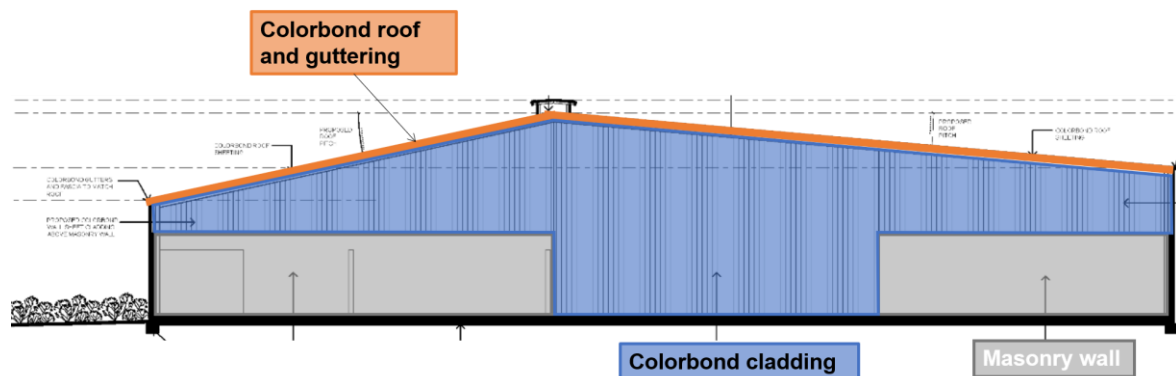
| Approved plan for the western elevation showing parts of external walls in Colorbond cladding
